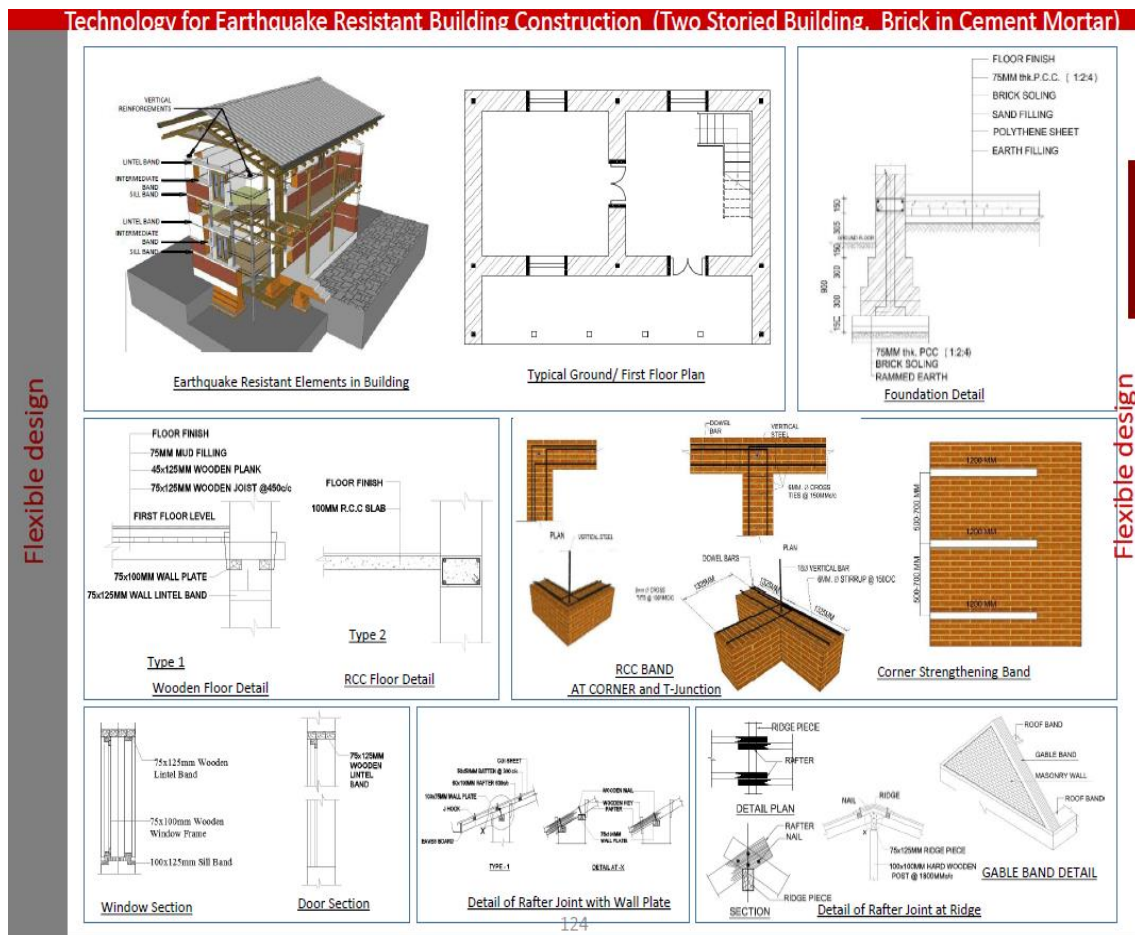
Methodology applied for construction of brick masonry buildings in Nepal
